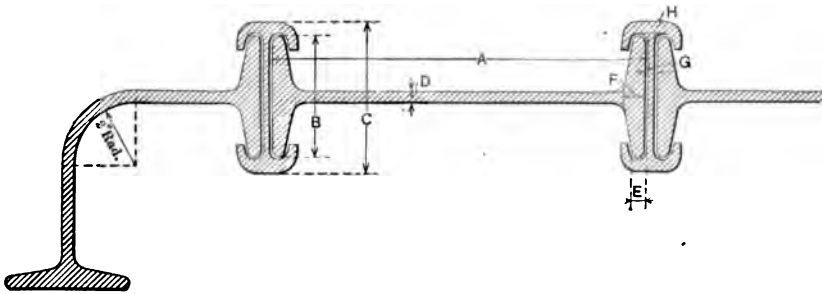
JONES AND LAUGHLIN STEEL SHEET PILING.
